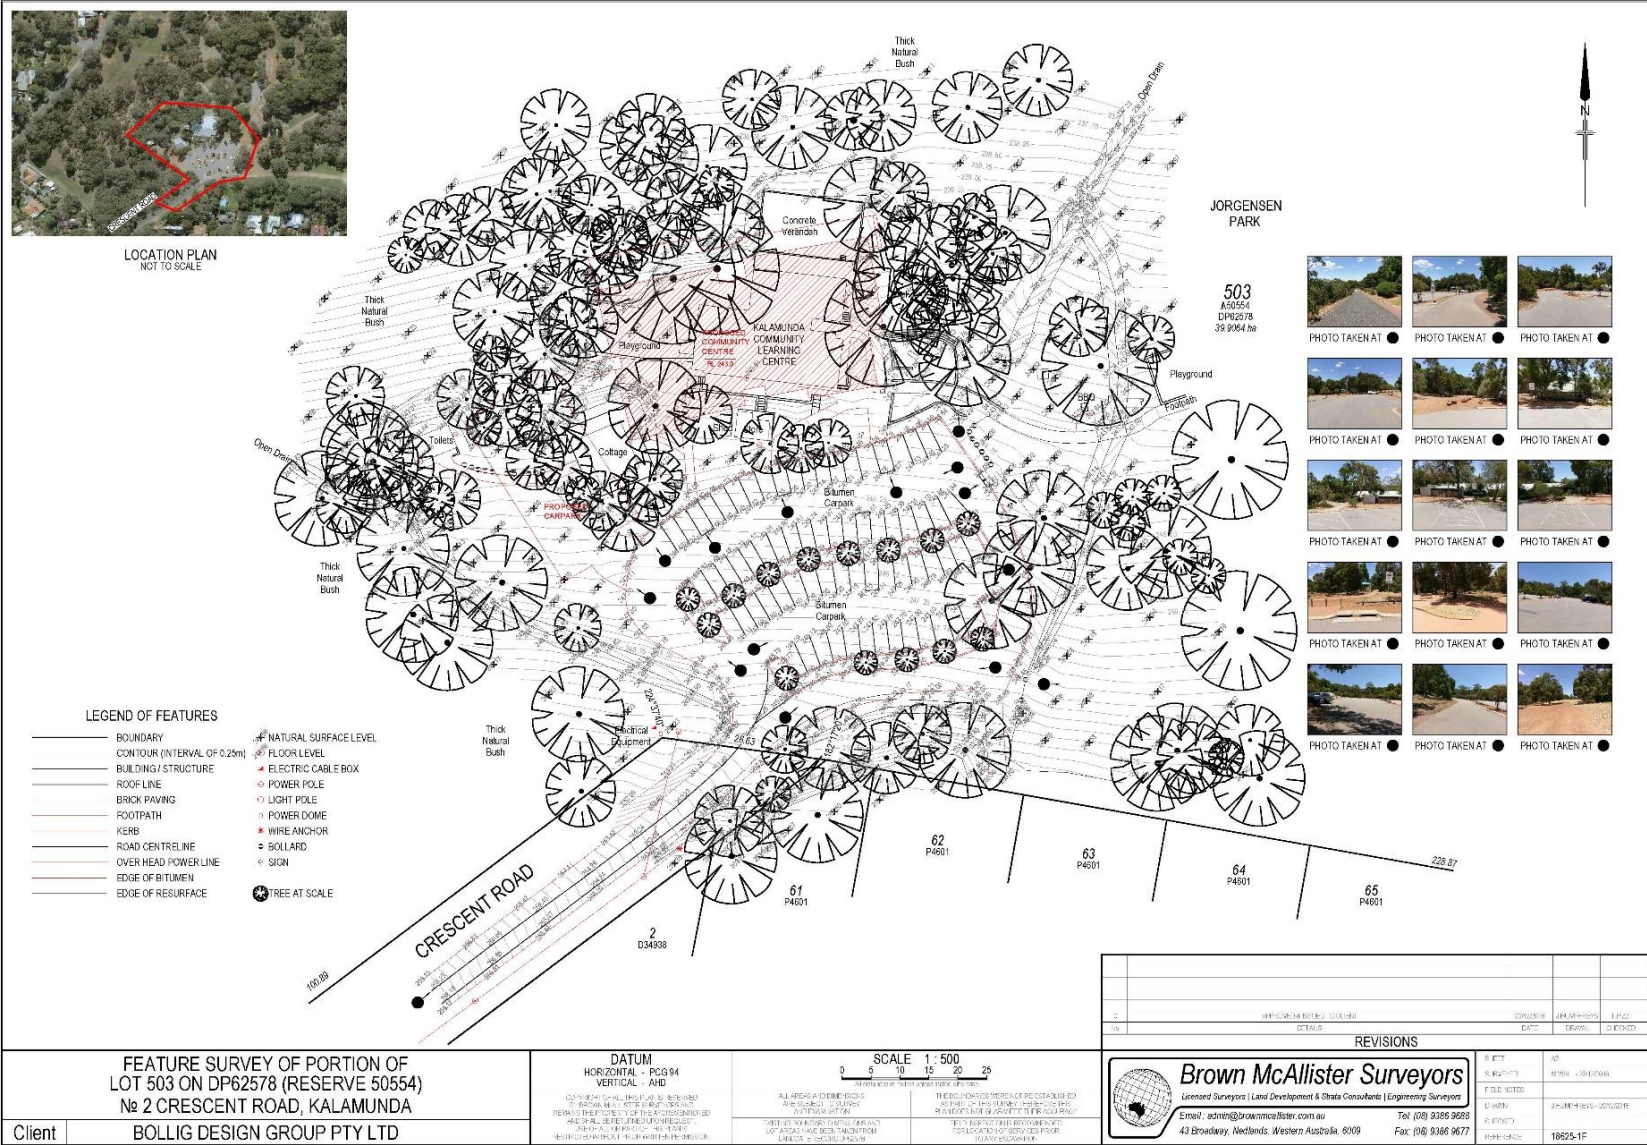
Final Site Plans for the Proposed Development – Proposed KCC and Surroundings
